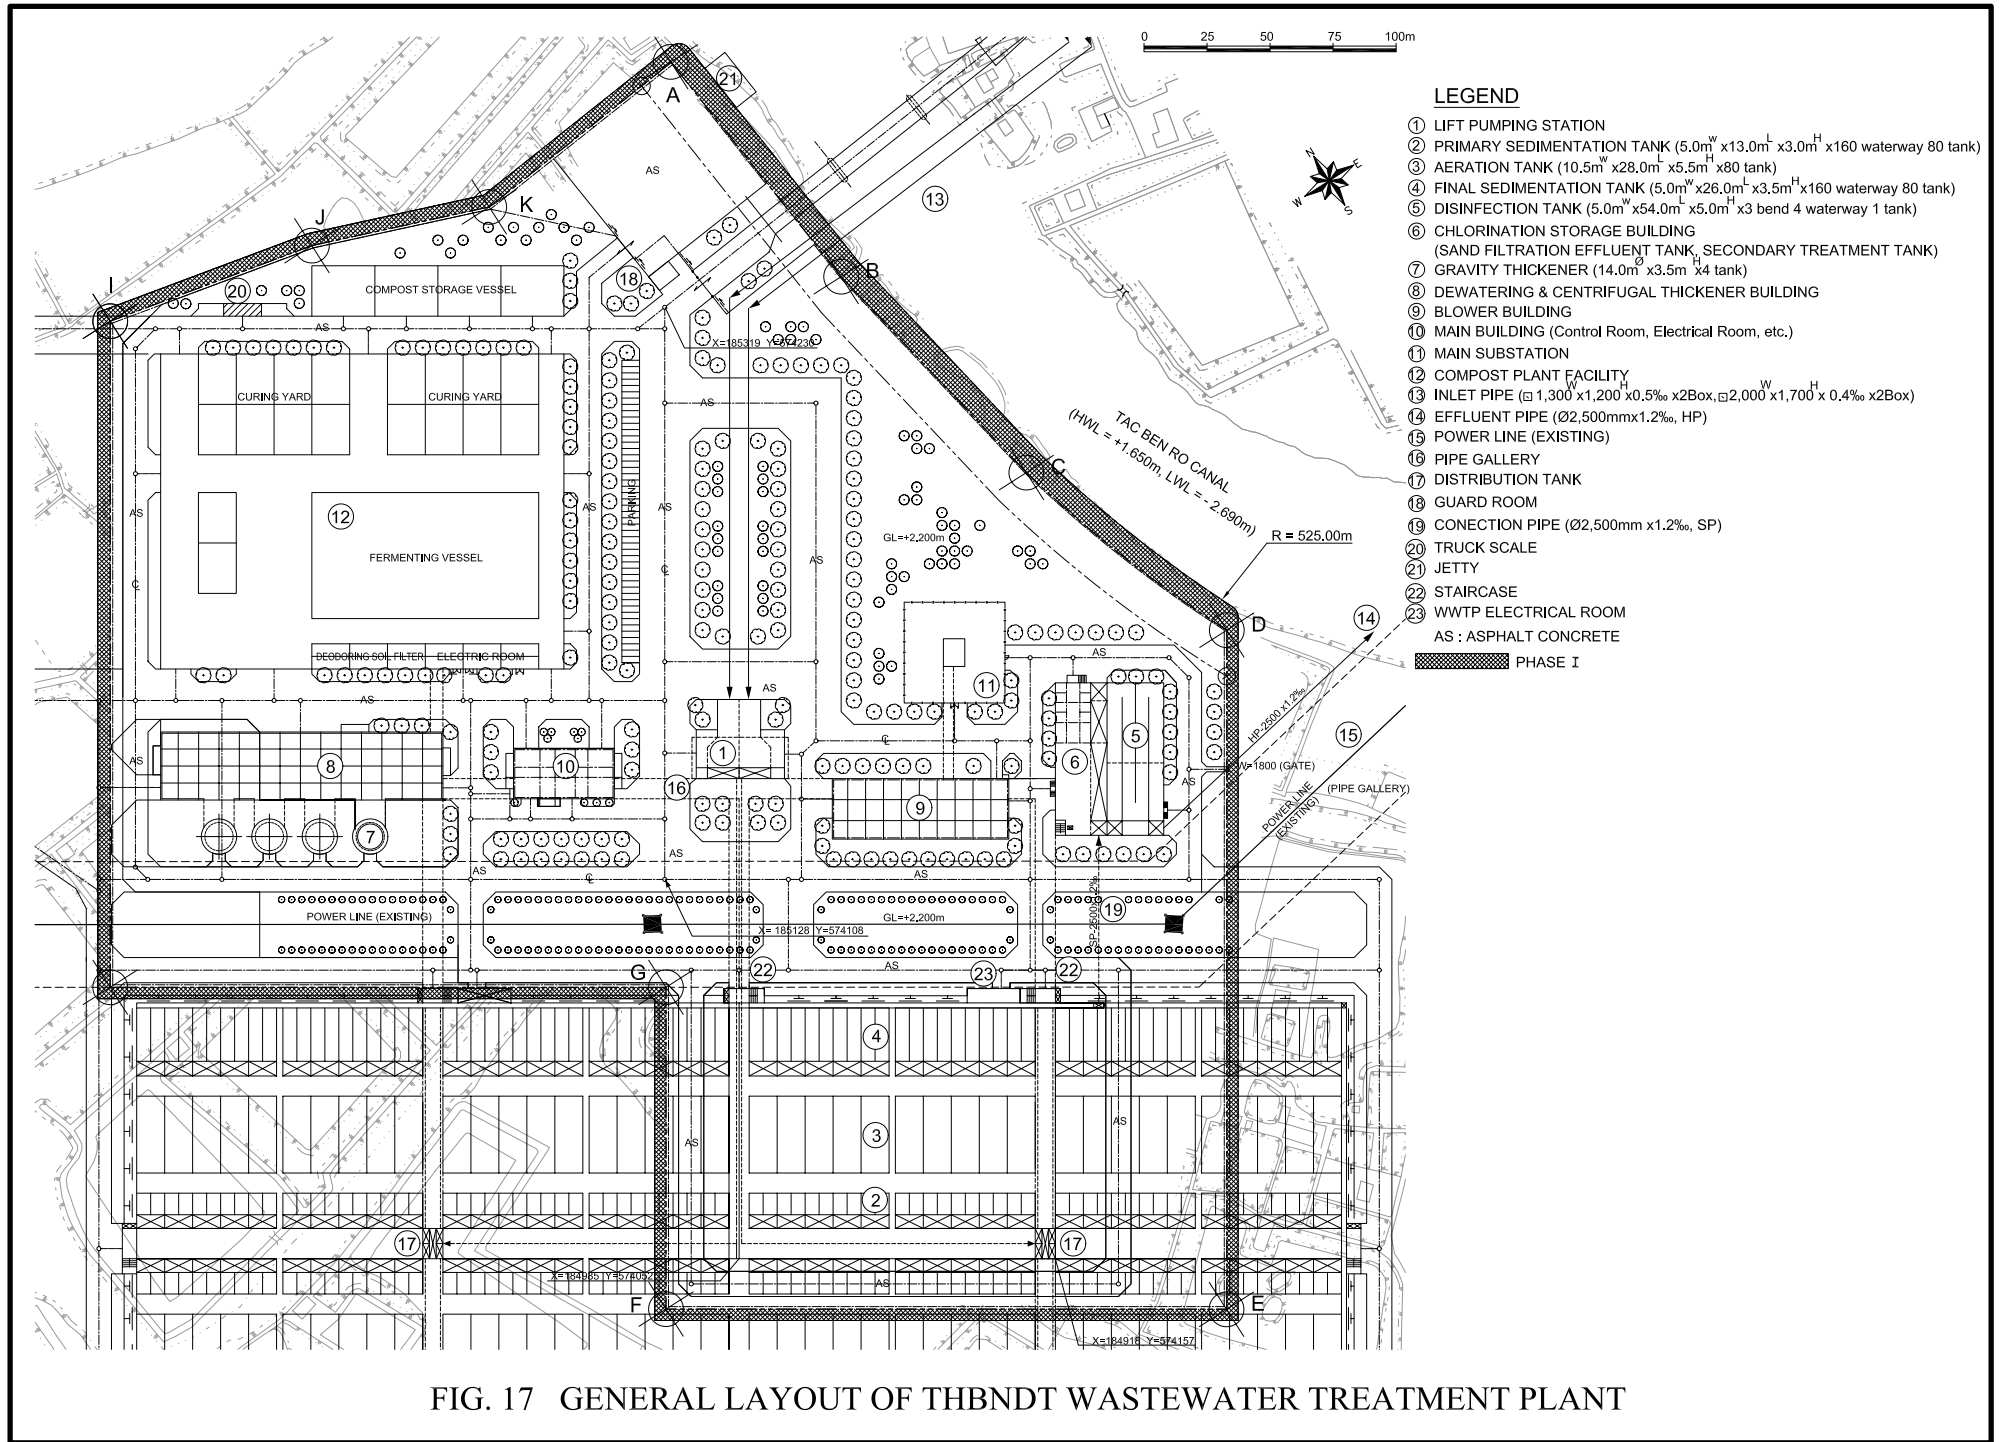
GENERAL LAYOUT OF THBNDT WASTEWATER TREATMENT PLANT
